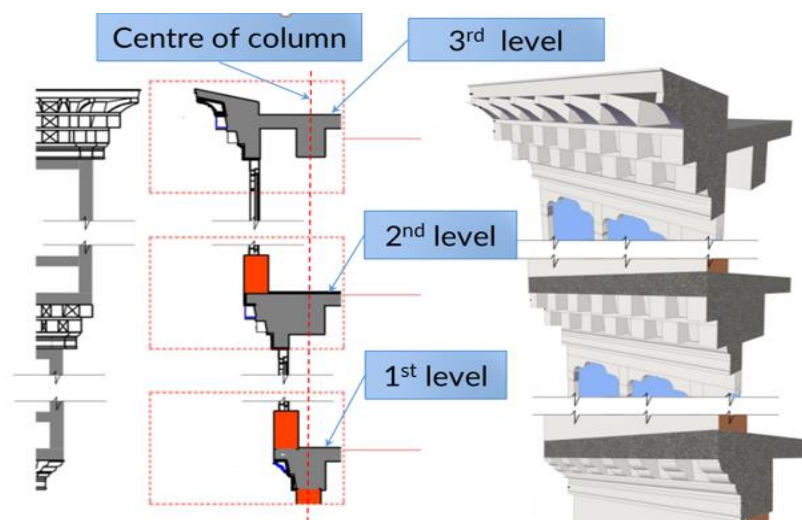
Reinforce concrete cornice details (MoWHS, 2014)
